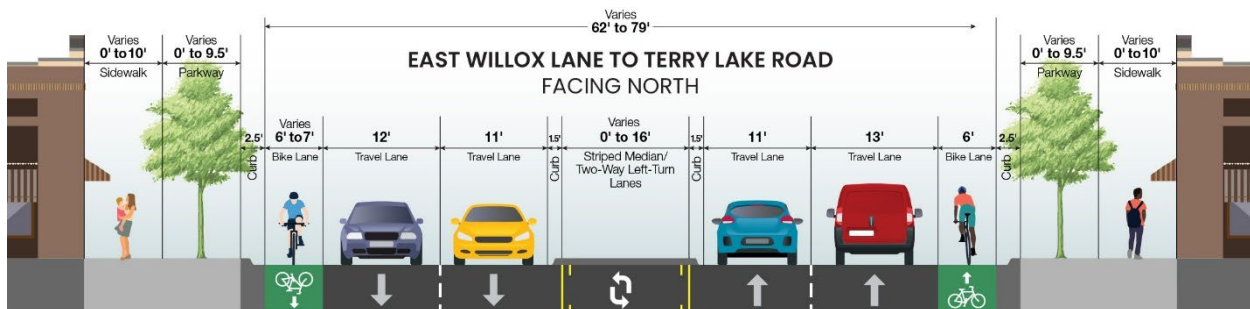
Cross Section: East Willox Lane to Terry Lake Road
